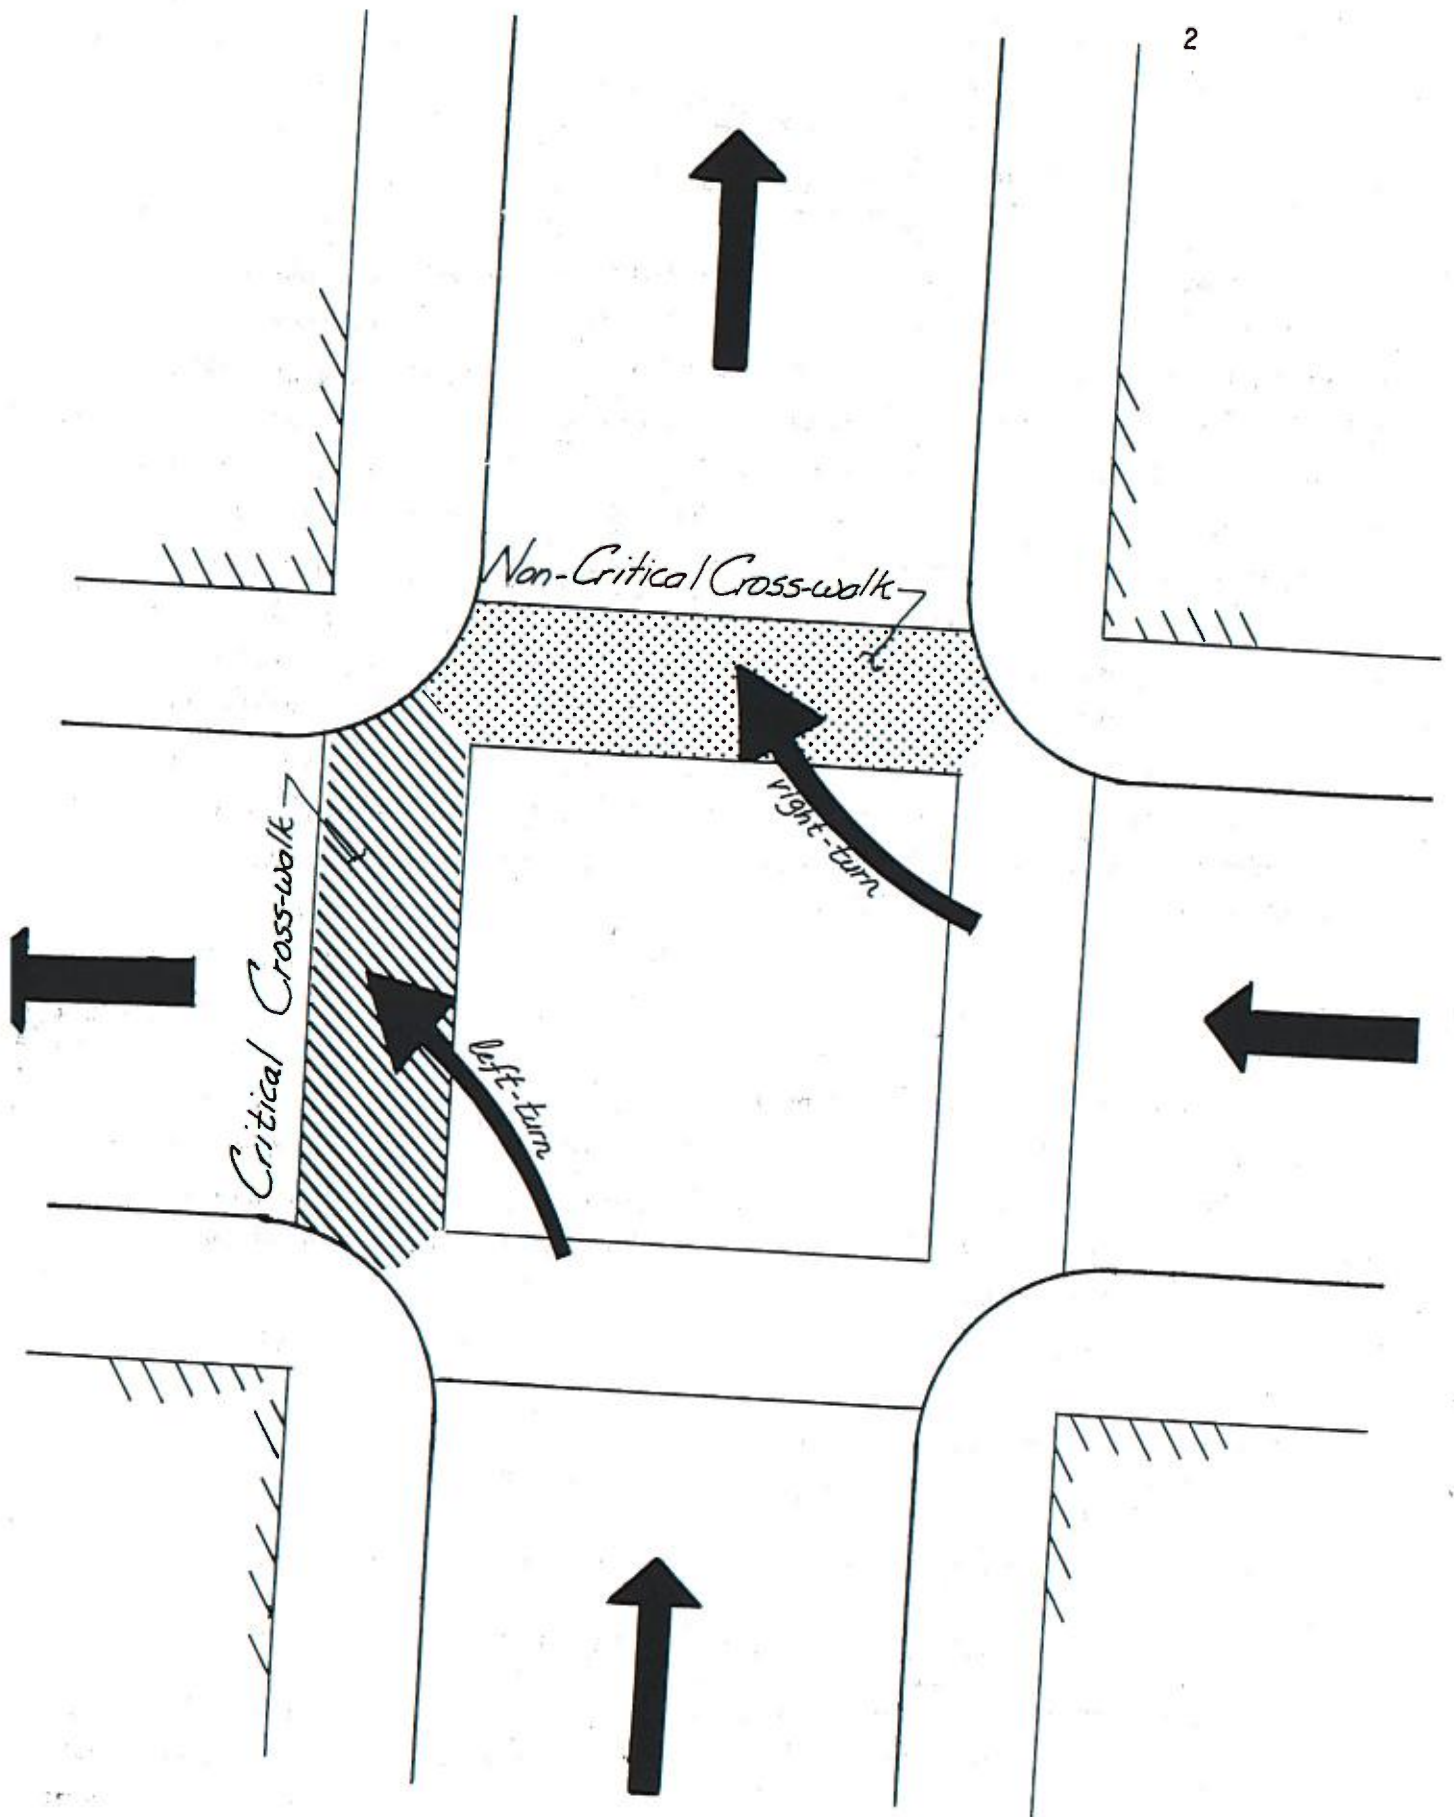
ONE-WAY INTERSECTION LAYOUT
